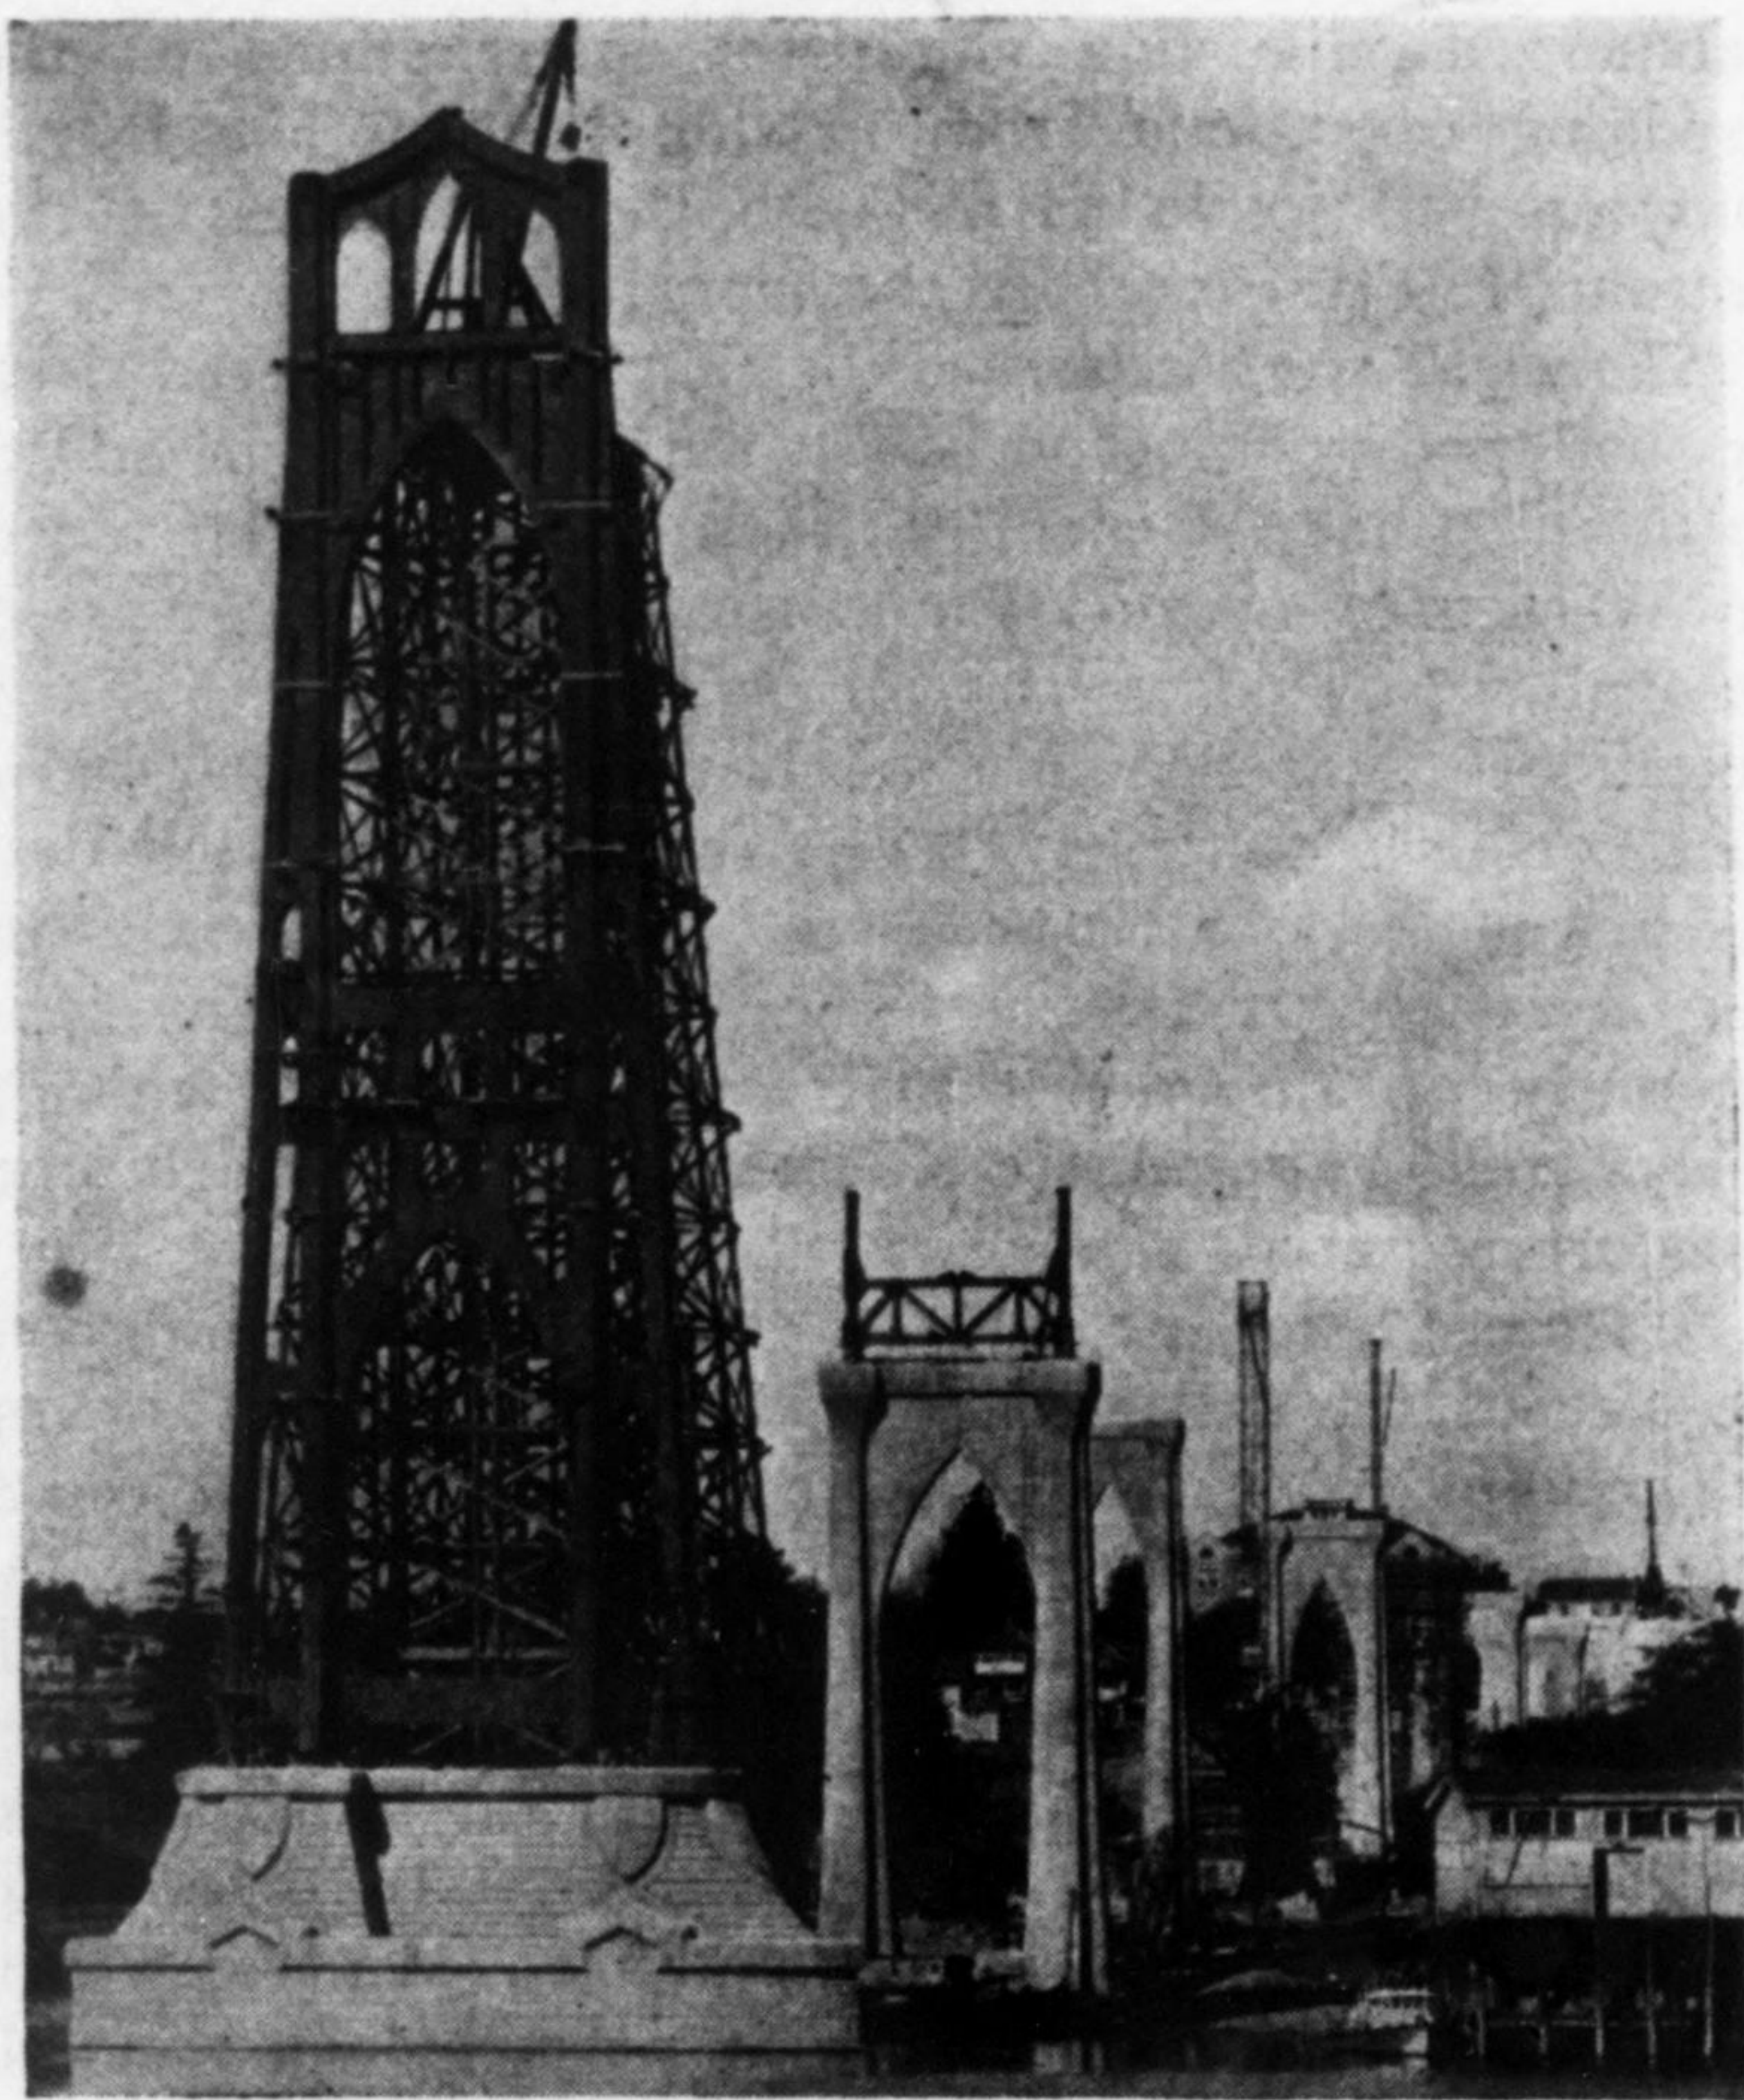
COMPLETED EAST TOWER WITH CABLE BENT AND APPROACH PIERS IN BACKGROUND
